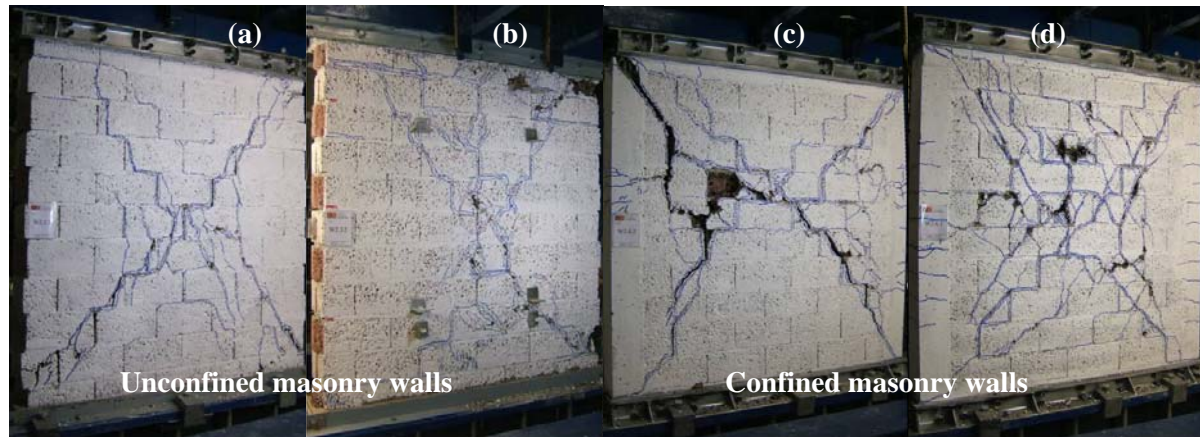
Typical failure modes for lightweight concrete masonry walls: (a) unreinforced; (b) lightly horizontally reinforced; (c) confined unreinforced; (d) confined and horizontally reinforced
